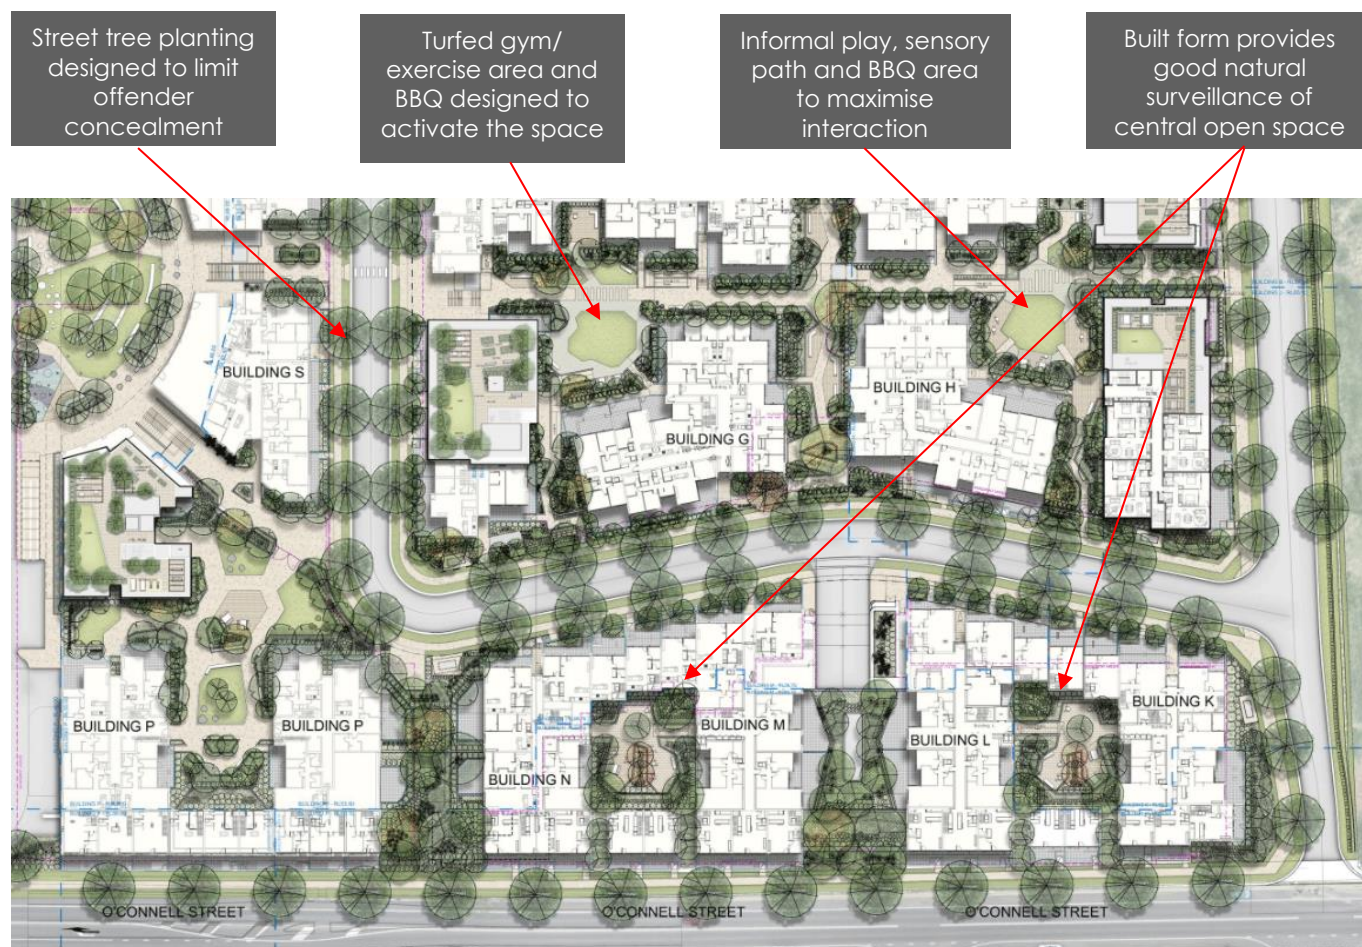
Landscaping around Buildings S, R, Q, P, F, G, H, J, N, M, L, & K (Source: Site Image Landscape Architects, 2024)
